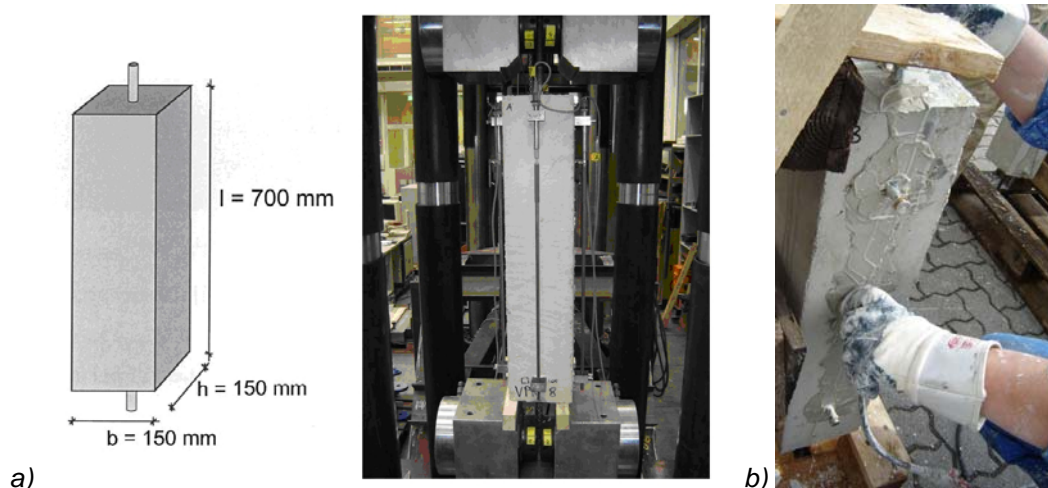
a) Test specimen and test setup for uniaxial tensile test b) Injecting the specimen
